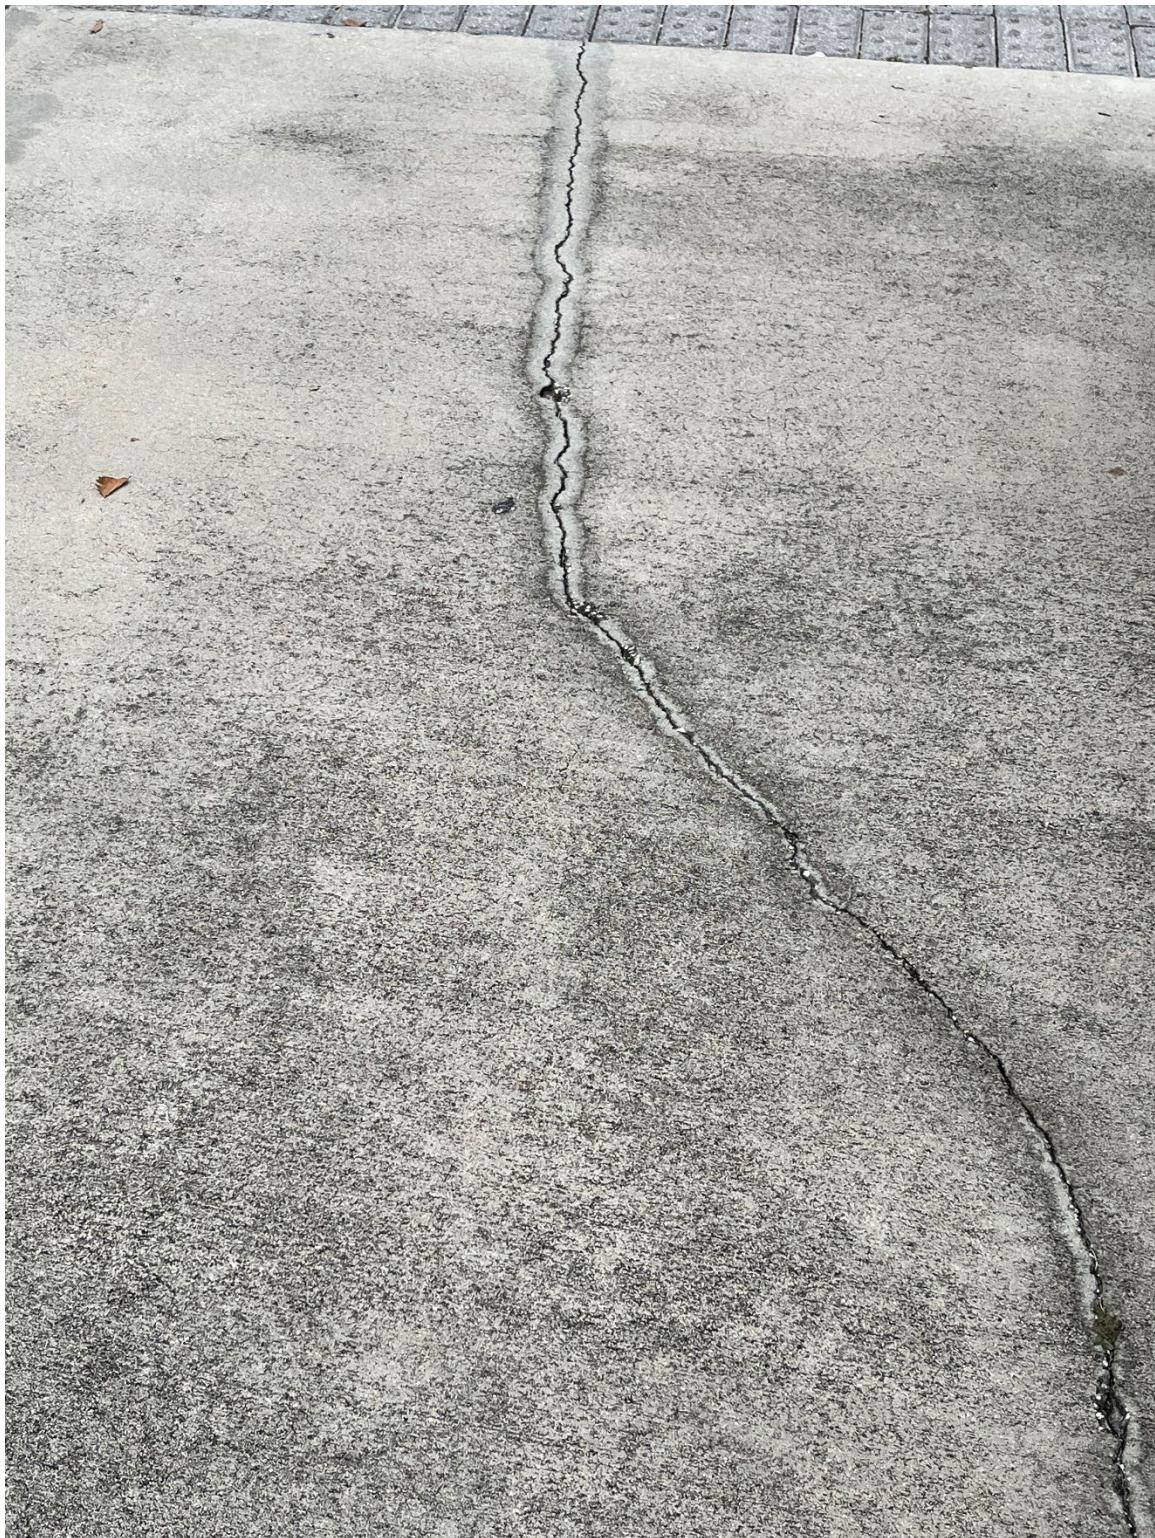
Surficial Concrete Cracks in Median Strip
